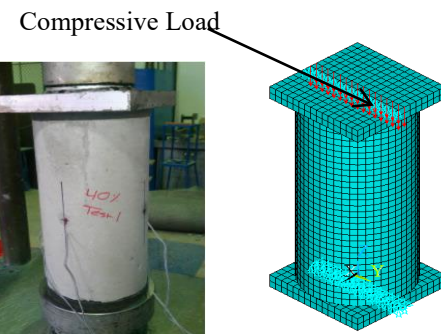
3D views wireframes for the steel plate and concrete elements for a typical cylinder model.
